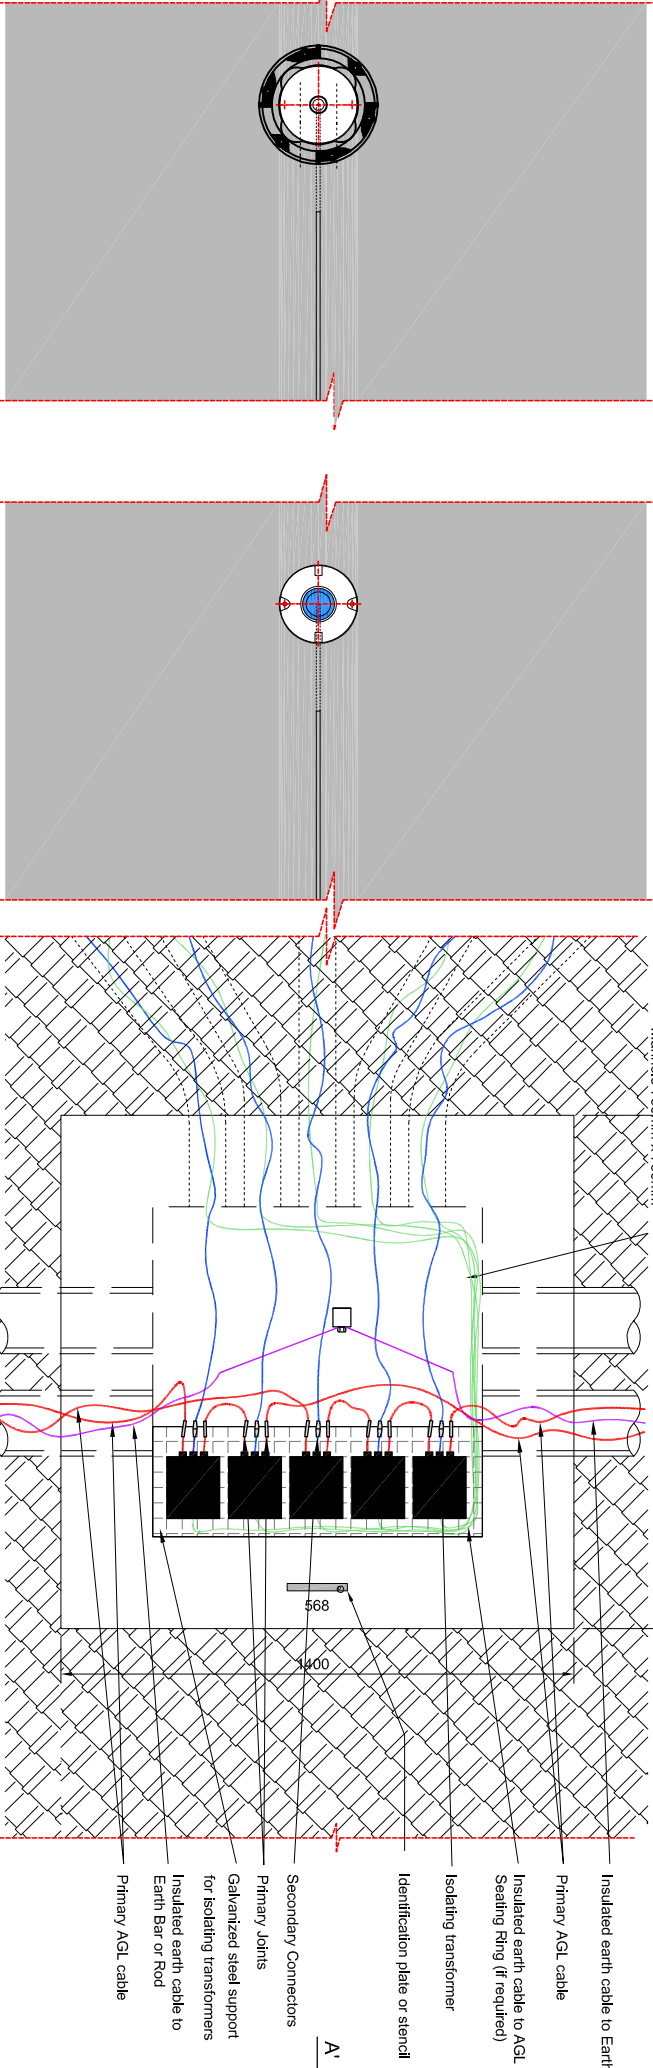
DETAIL OF INSET AND ELEVATED LIGHT FED VIA DUCTS
